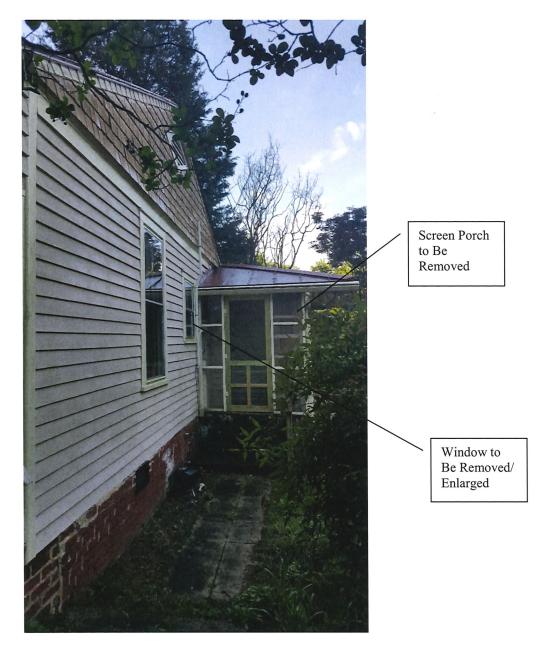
North Elevation w/ 1960's Addition to Be Removed
